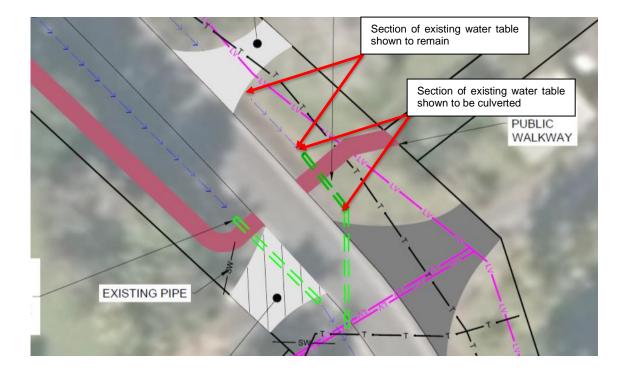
Extract of design drawings showing section of existing water table to be culverted and section to remain
